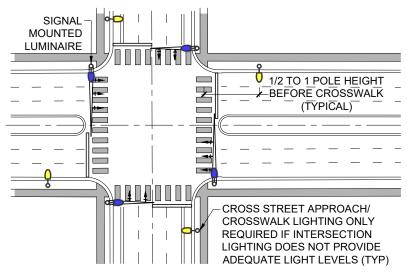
Typical Intersection Lighting Layout with Signals and Continuous Lighting
